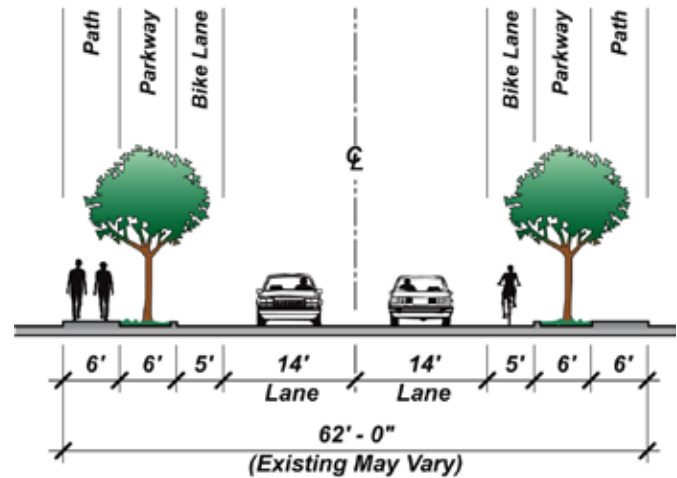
Typical cross section of two lane major collector between cantonments.
